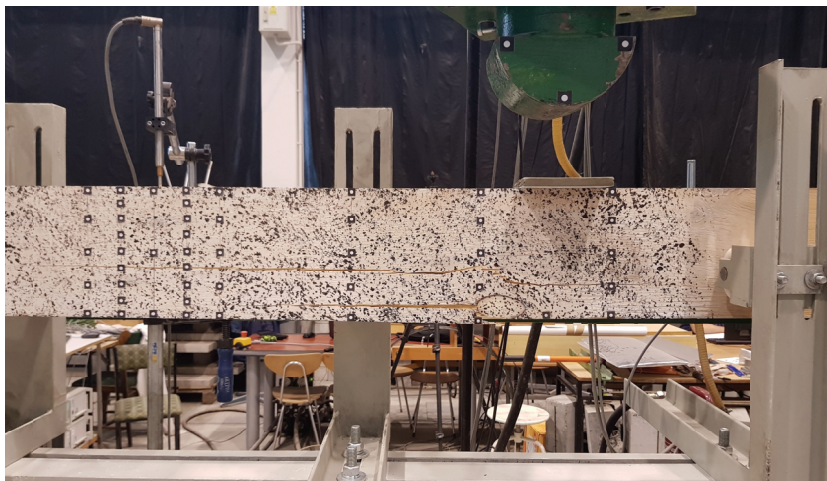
Failure mode of unstrengthened beam – A1 (tension)
